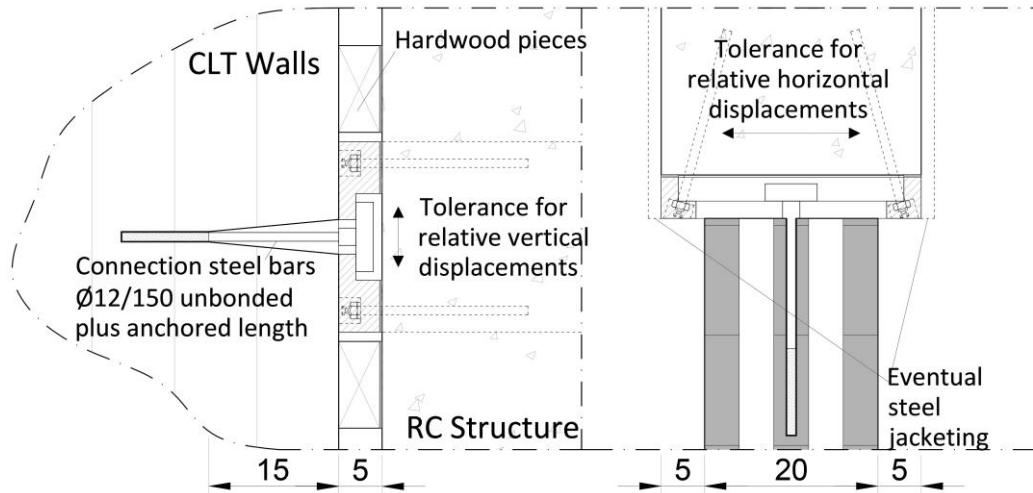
Sketches of the vertical distributed connection between CLT walls and RC vertical structural elements
